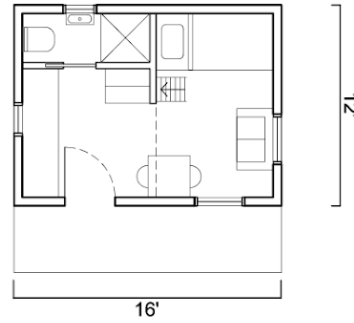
A. Floor Plan Study: Building Areas of Sleeping Unit and Hybrid Homes. (Image by author).
